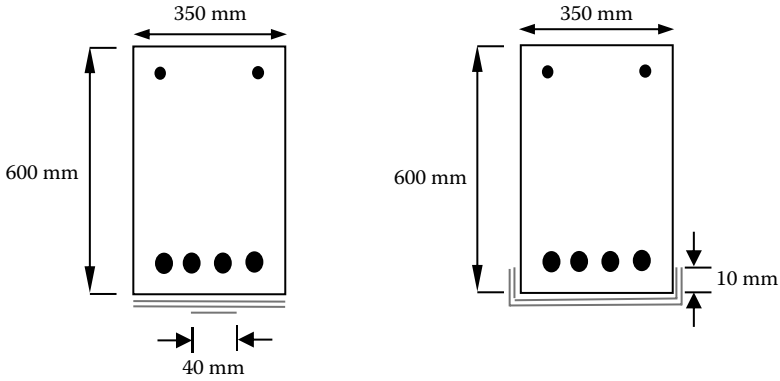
Example 5.7 showing the alternative FRP design details.
